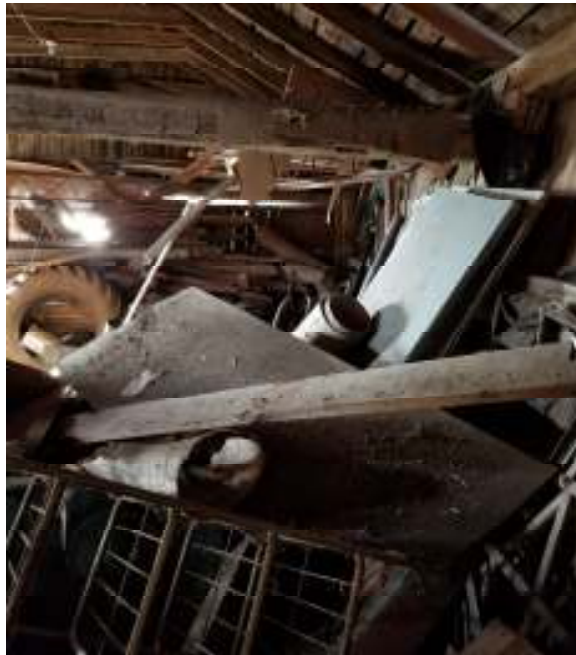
Photo taken along the north (rear) interior wall of the existing shed.
